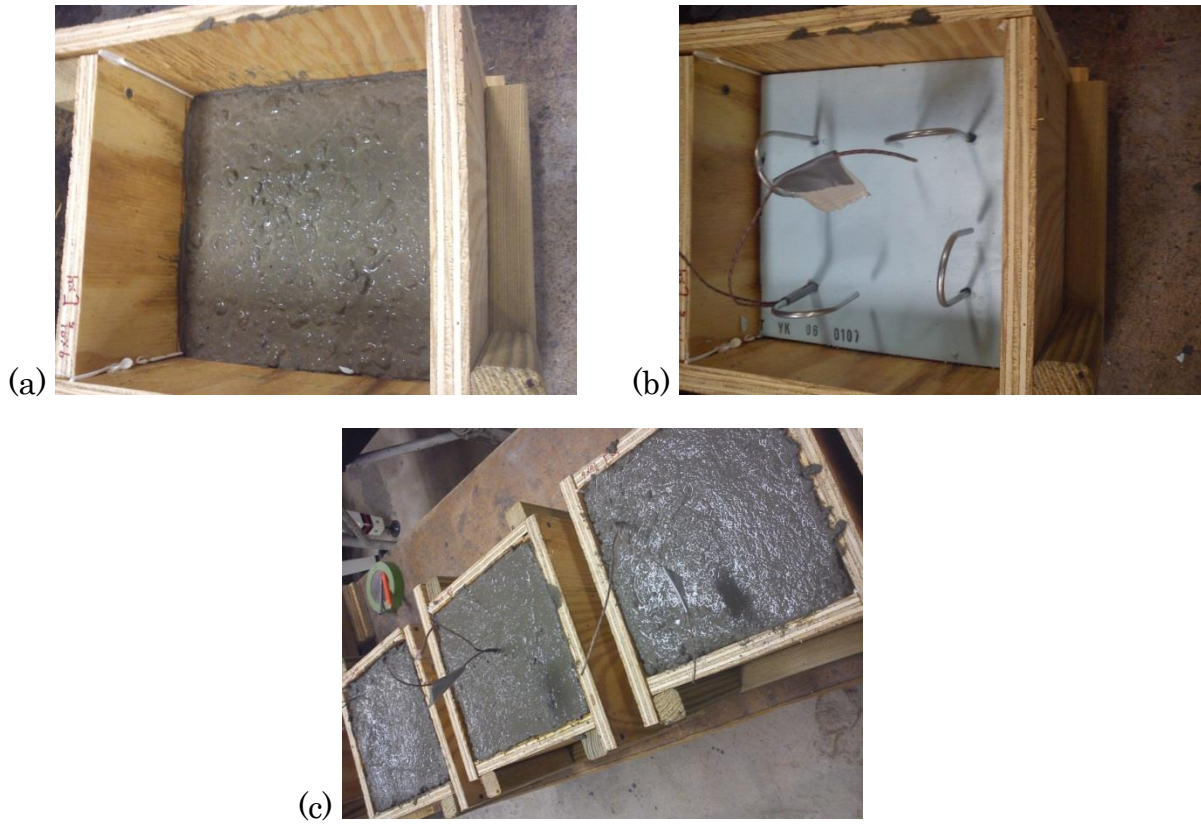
Experimental Setup; a: Three inches of concrete, b: Additional insulation, c: Additional three inches of concrete
